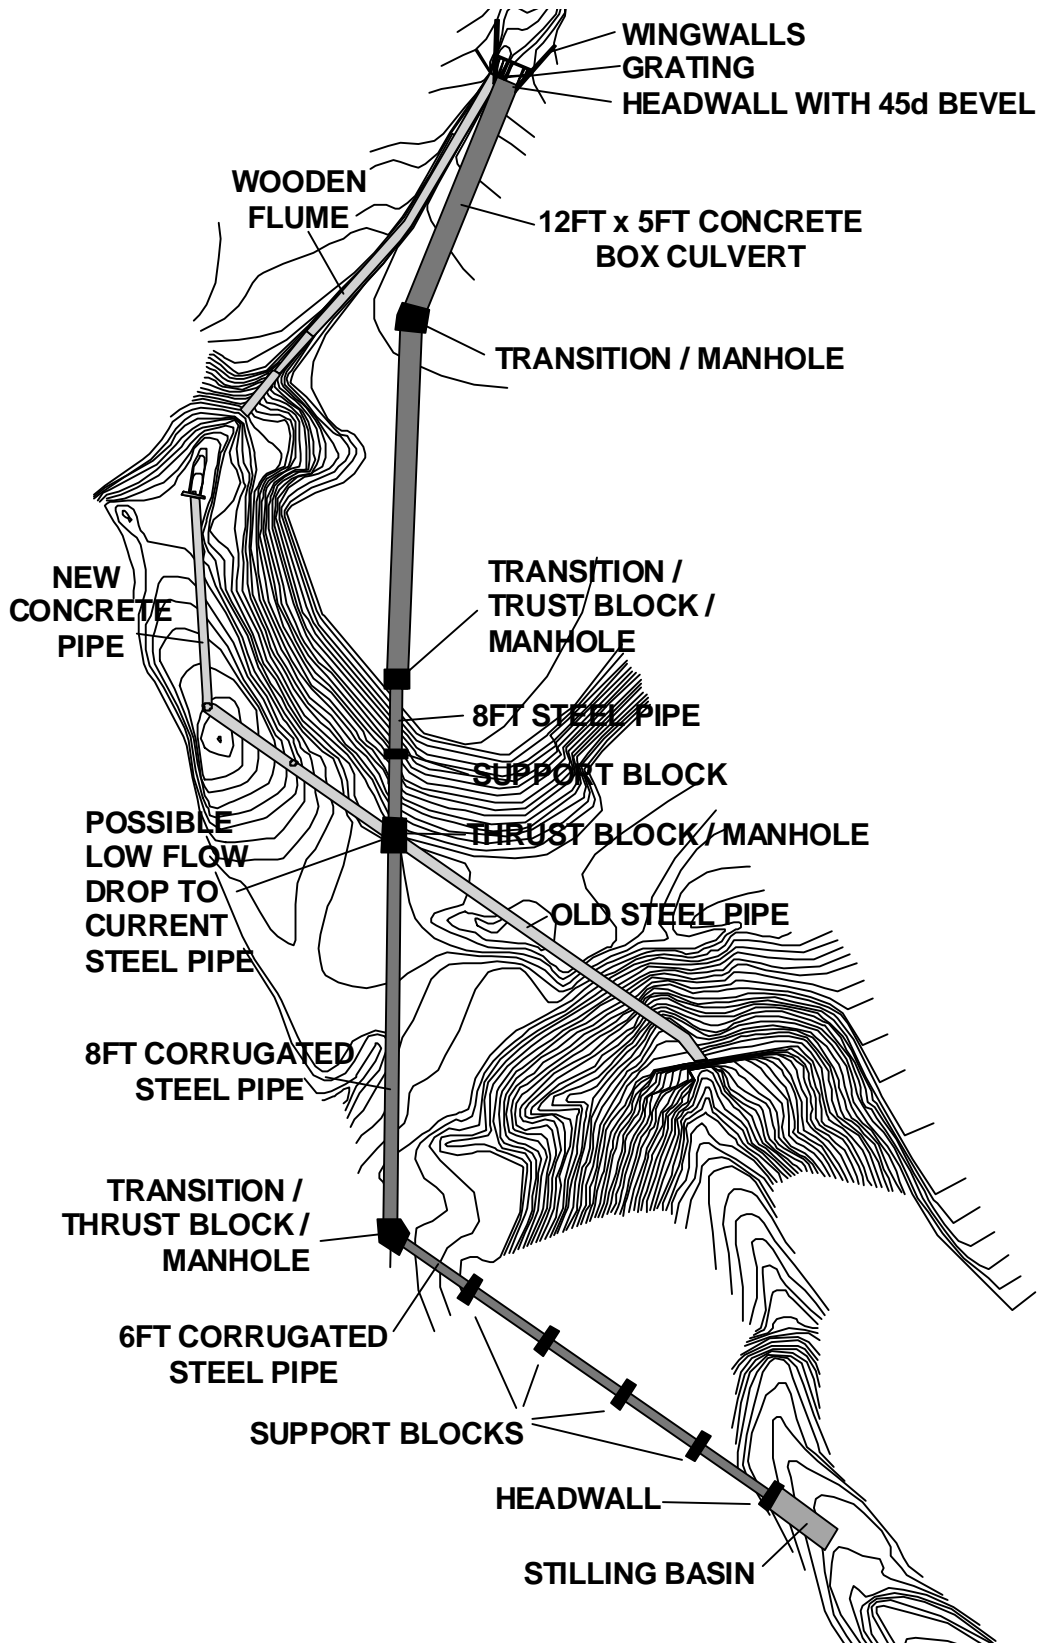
Plan view of Commodore flood bypass “preliminary” design
